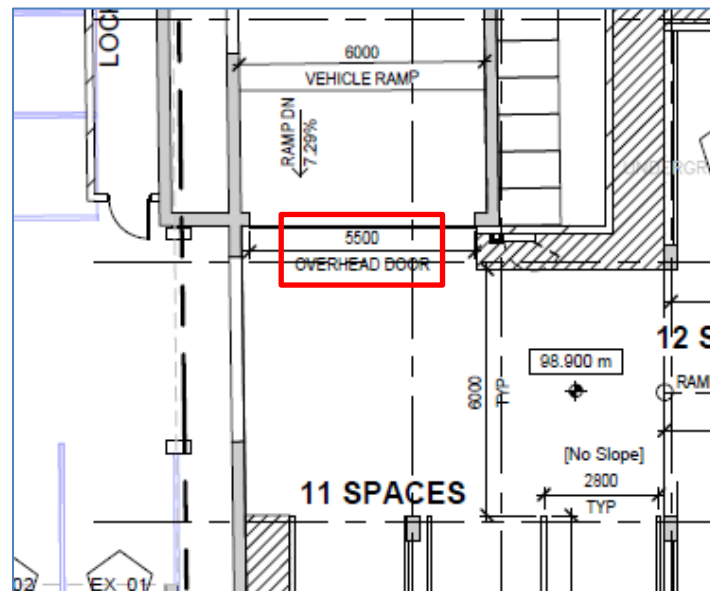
Revised Site Plan Overhead Door Width (November 18, 2024 Site Plan)
